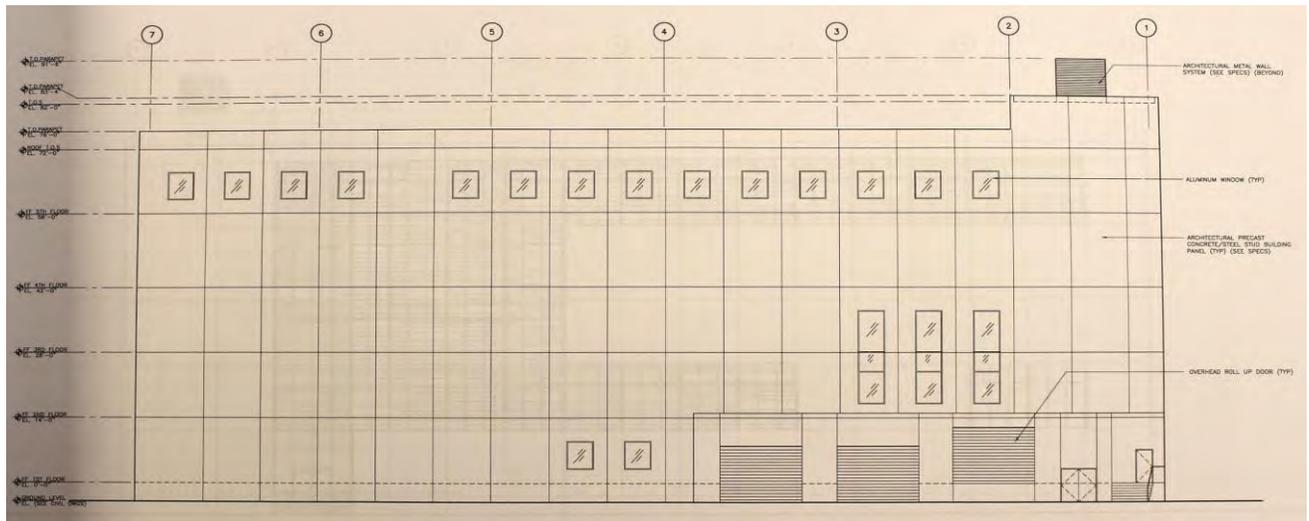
Architect's supplied drawing sheet: east elevation for the new Criminal Evidence and Processing Complex located at 2761 Gravier Street, New Orleans, LA.
